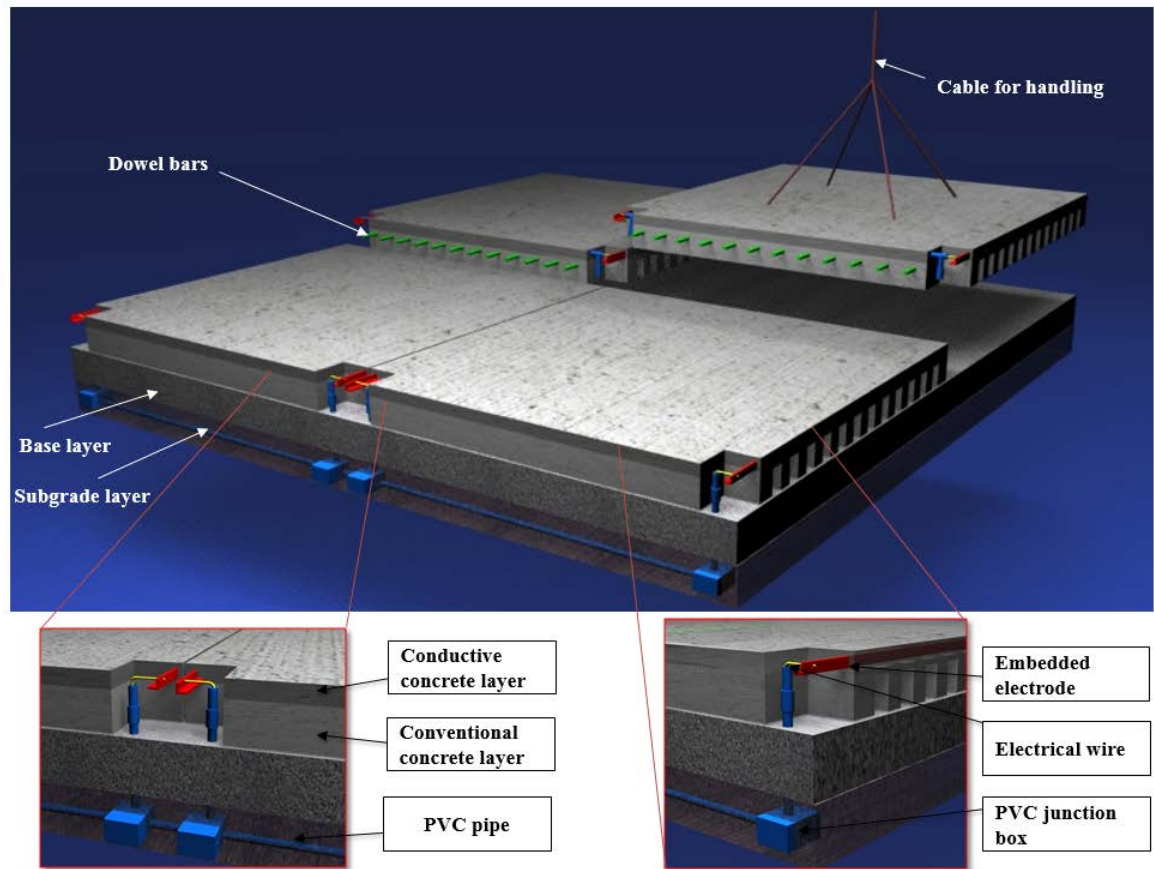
3D artist rendition and visualization schematics for construction of ECON heated pavement system utilizing precast concrete technique
